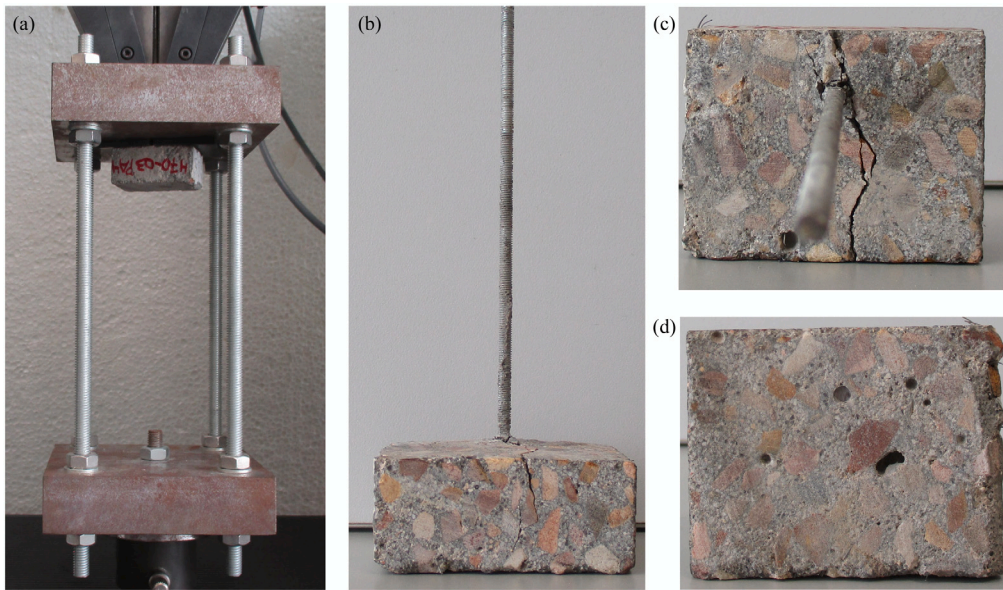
Steel bar pull-out test in SCSFRC ($\phi_f = 0.3\%$): (a) setup configuration; (b) steel bar pull-out after the test and elevation detail showing the cracking process; (c) detail of the pull-out cracking on the top surface of the specimen; (d) detail of the bottom surface of the specimen after the pull-out test.
